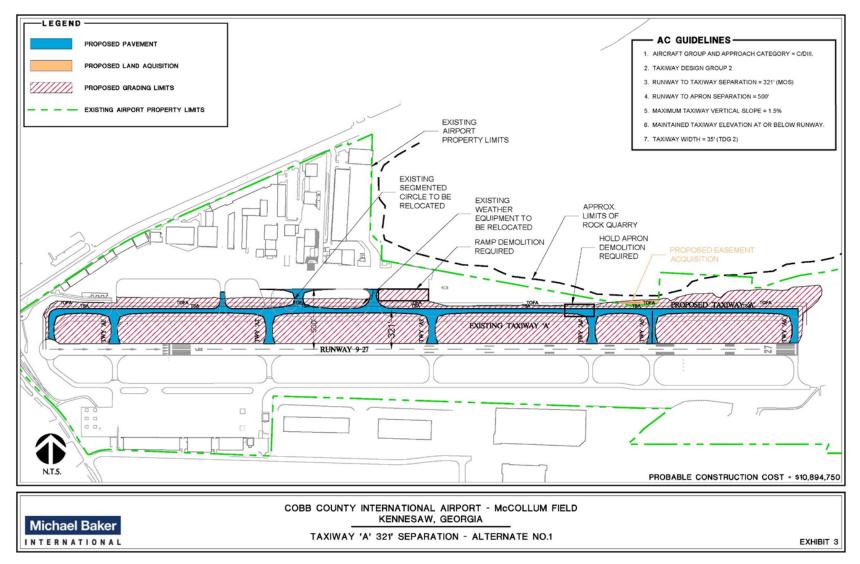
Taxiway 'A' Relocation, Alternative 1d (321-foot Runway/Taxiway Separation)
